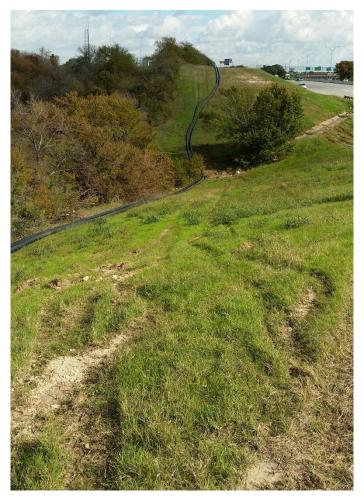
Temporary Pipelines Installed at the Bottom of the Ditch and Rutting Caused by Vehicles or Equipment.
